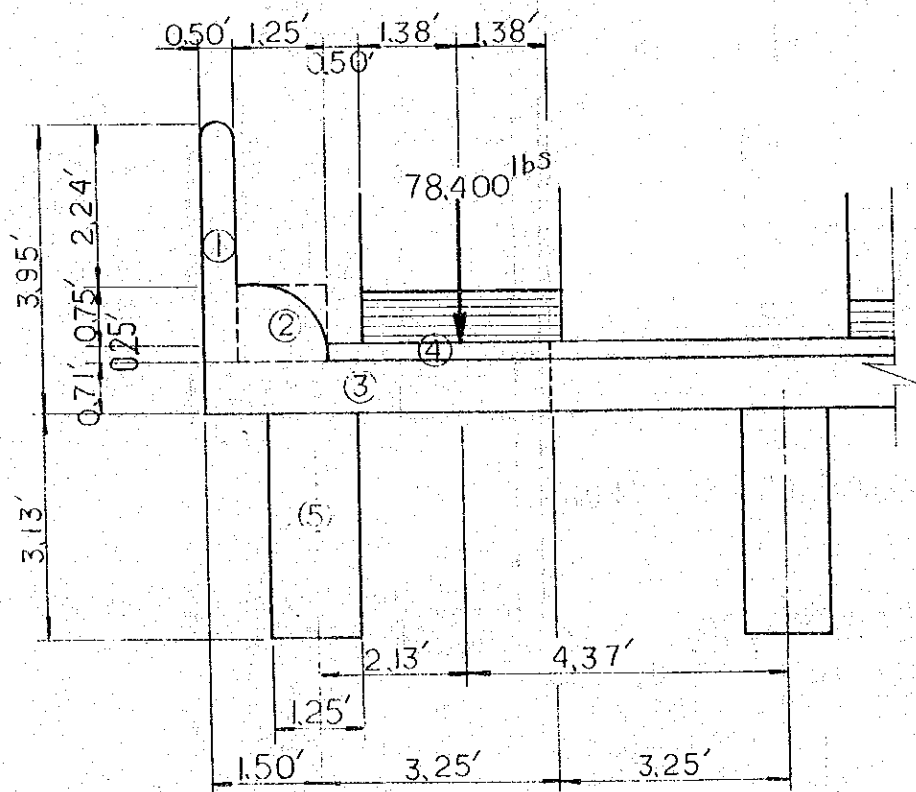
LOAD FOR EXTERIOR GIRDER
